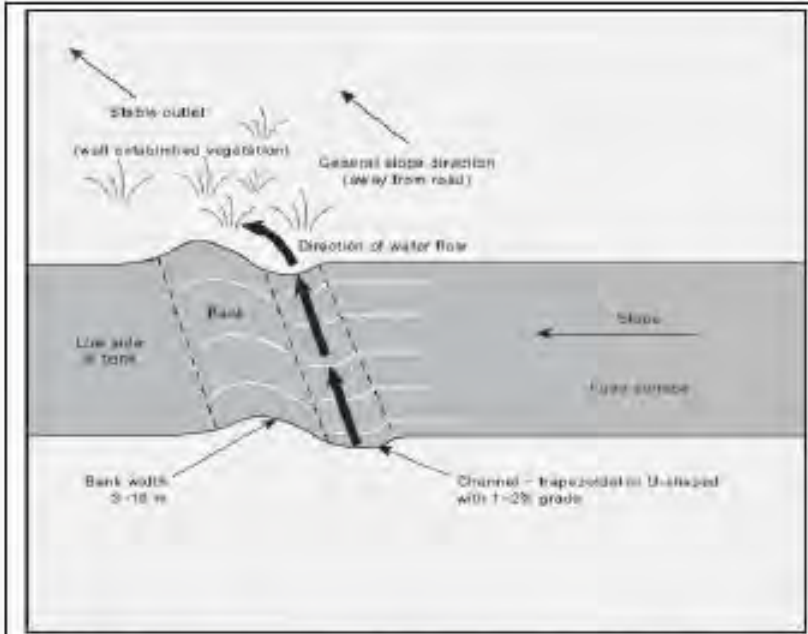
Typical Cross Bank Construction (DECC 2008, modified from Beatty 1995)
